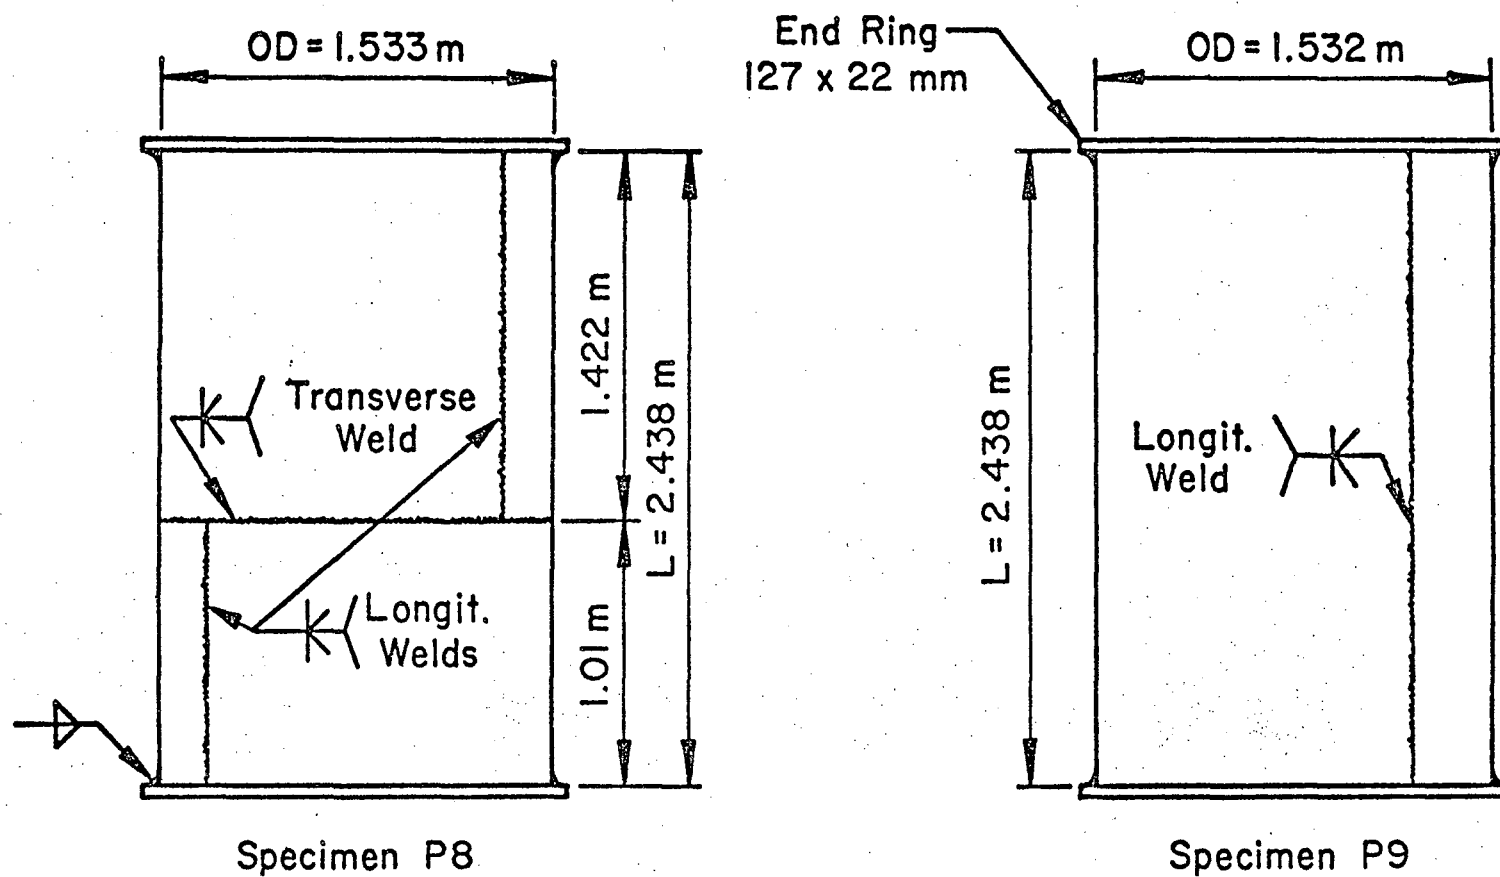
Test Specimens P8 and P9 and Pertinent Dimensions
